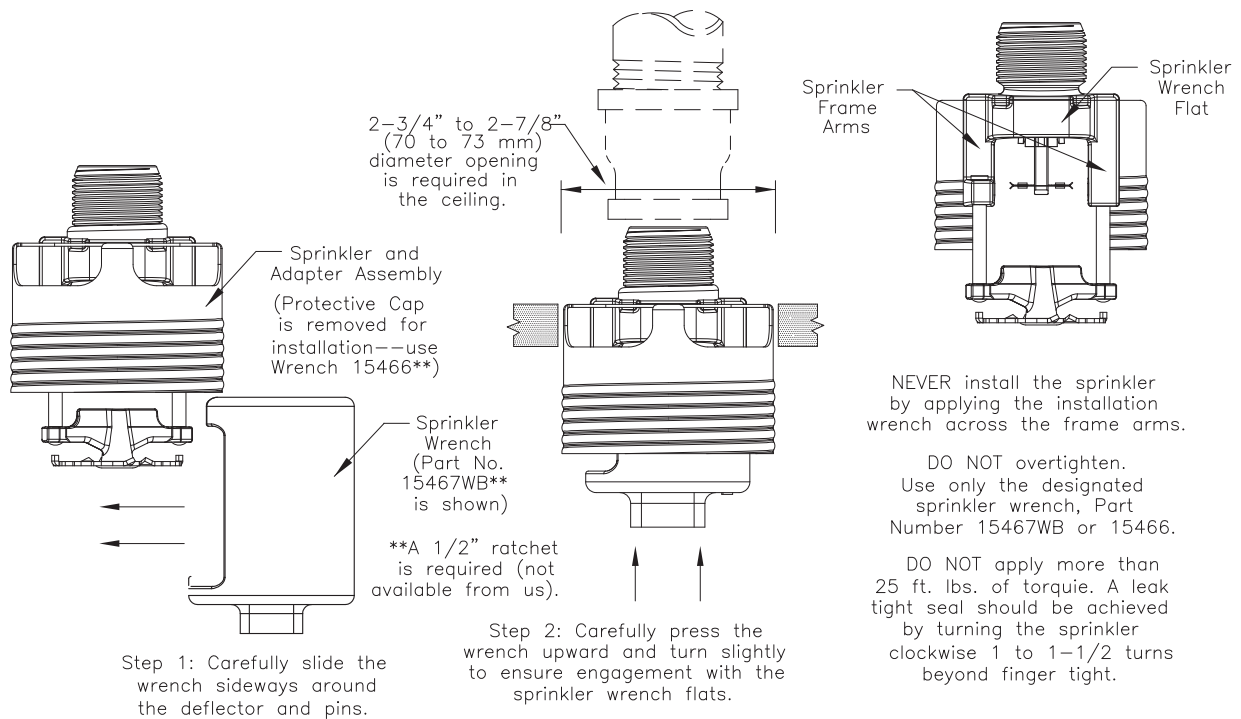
Sprinkler Installation and Correct Use of Wrenches
